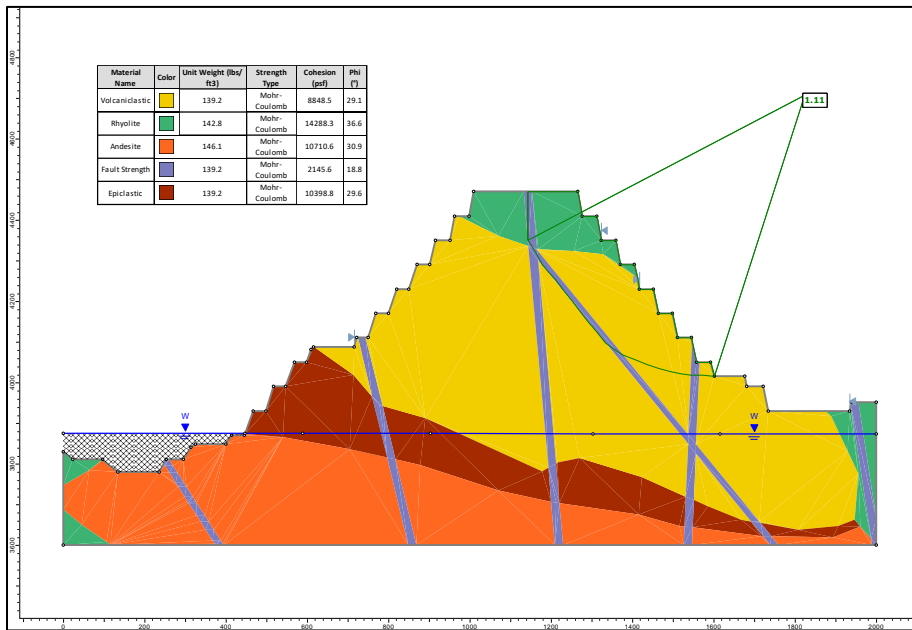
Section 6 – East, Assuming 2023 Water Surface
